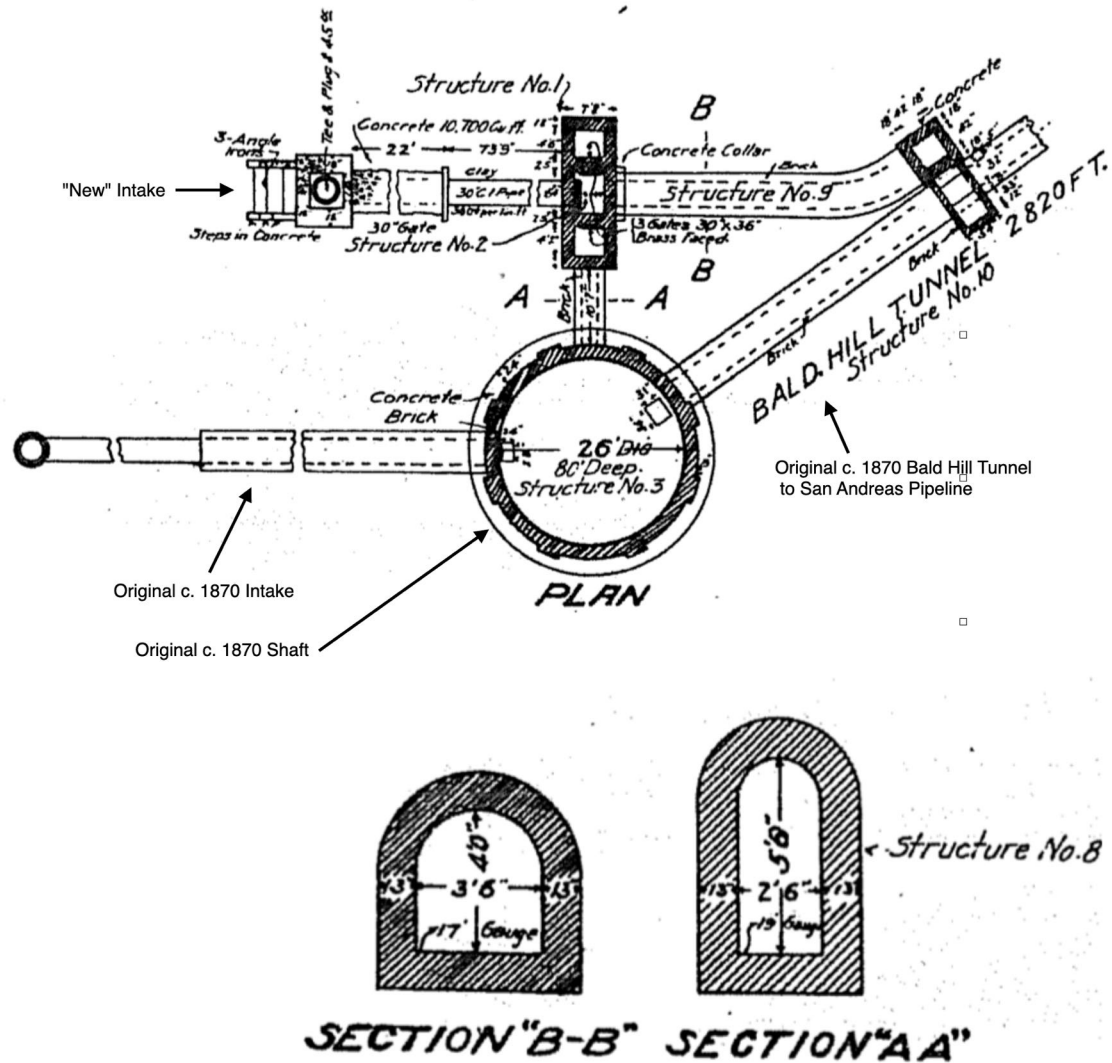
Plan and Details of San Andreas Outlet Works, 1914 (SVWC drawing)
